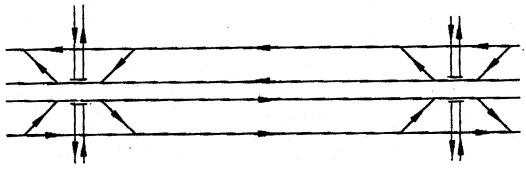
A Distance "A" from Ramp/Frontage Road to Intersection with Minor Road
